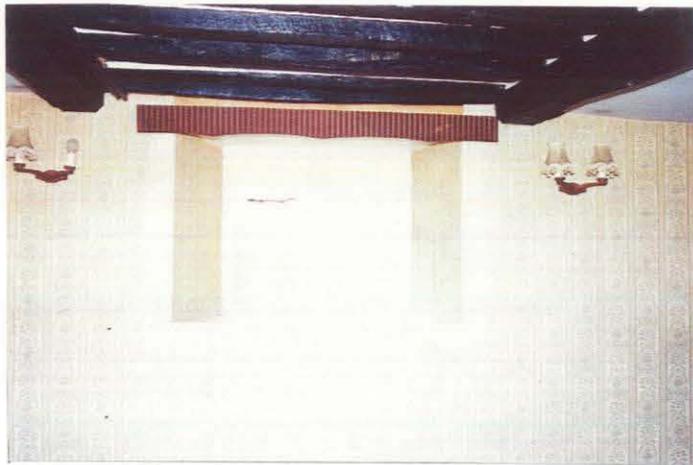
Lounge 65/4, no.65; north wall featuring splayed window opening at the its western end.
